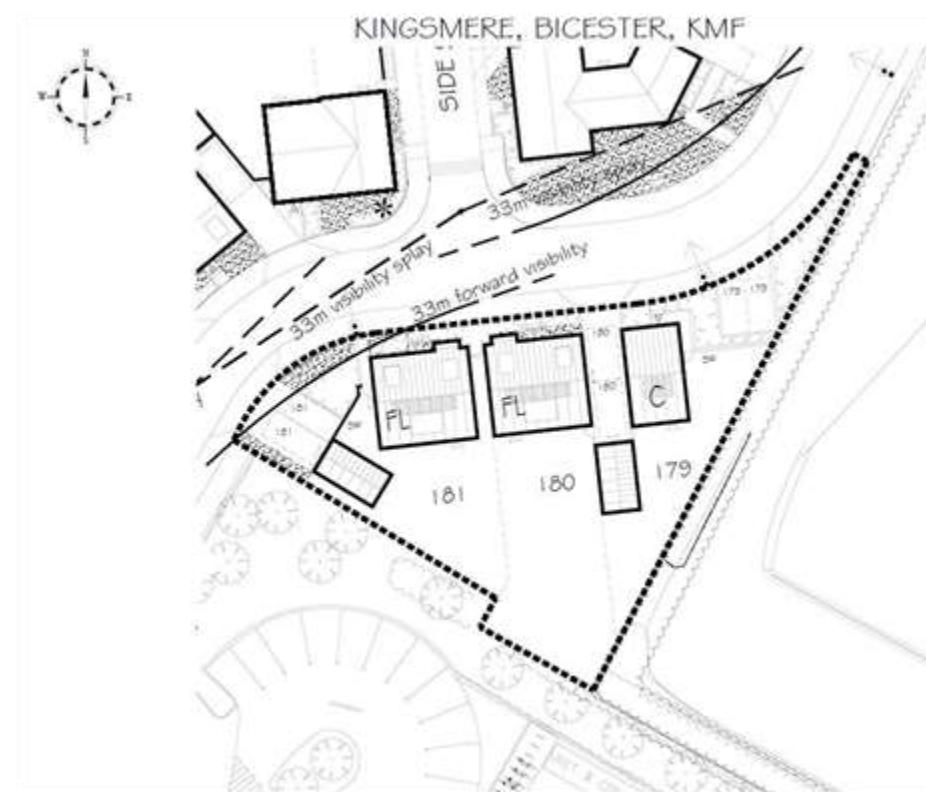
Proposed site layout – Bicester KMF plots 179-181
